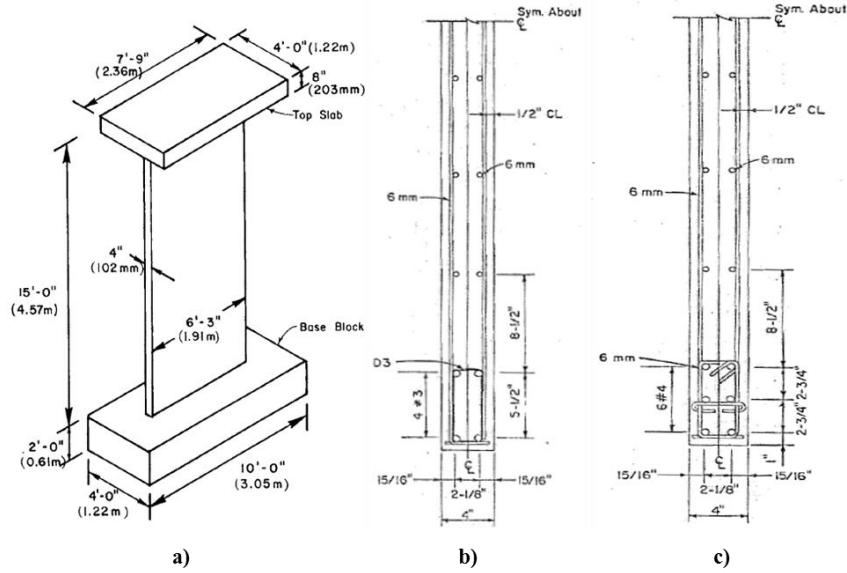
Oesterle et al. (1976) rectangular walls – a) Specimens dimensions, b) Specimen R1 cross-section, and c) Specimen R2 cross-section
